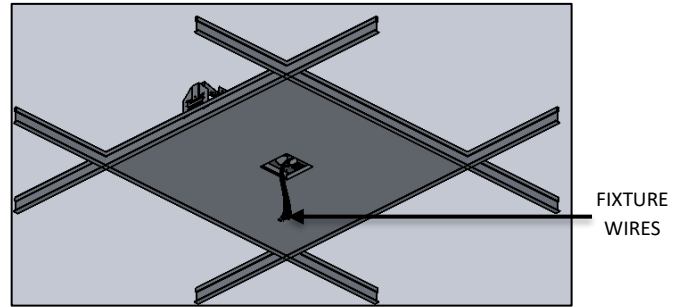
ASSEMBLED VIEW SHOWING RECESSED J-BOX TO THE CEILING
